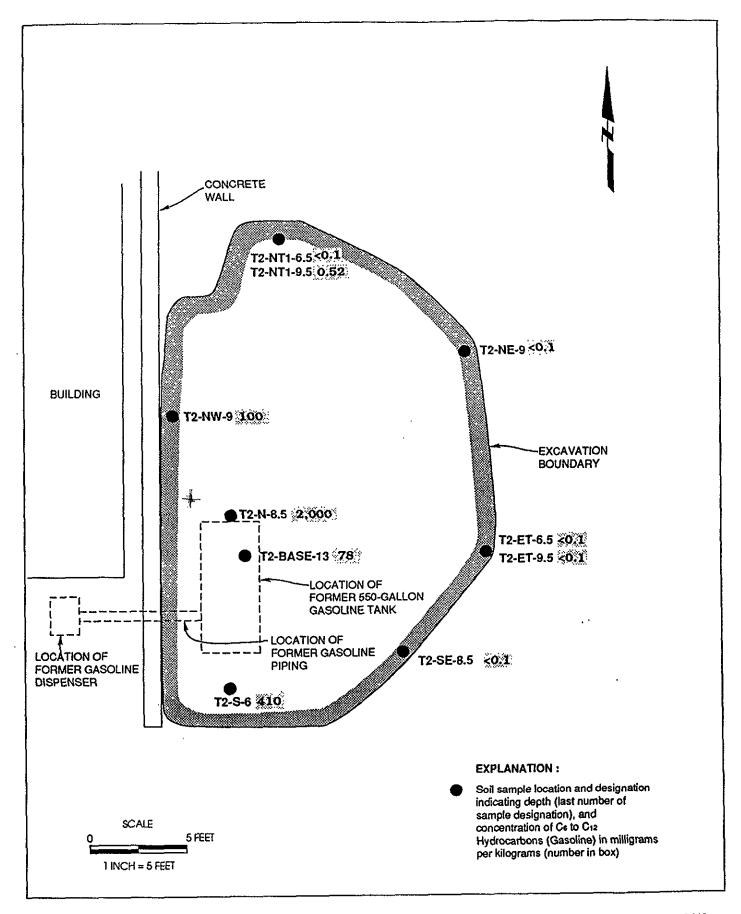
SITE PLAN SHOWING FORMER TANK LOCATION, EXCAVATION AND SOIL SAMPLE LOCATIONS
